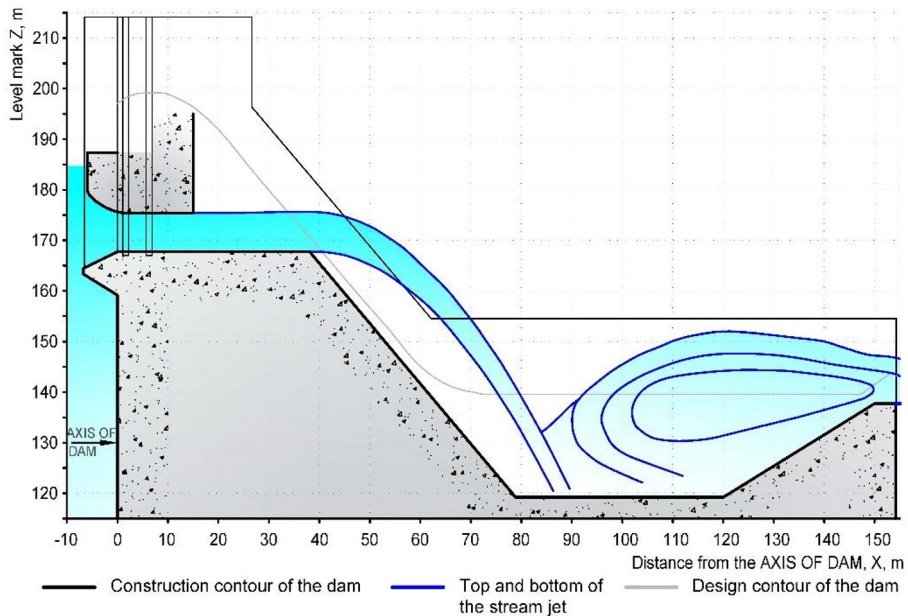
Longitudinal profile of spillway No. 2 for construction period with pressure passage of water out from opening of spillway and energy dissipation in stilling basin.
